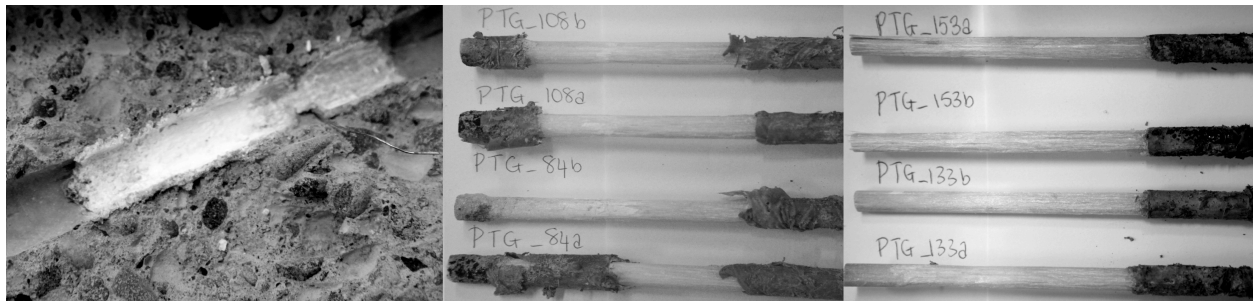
Residual Bar Coating (left) and Typical Bond Failures for Bar PTG (right)
